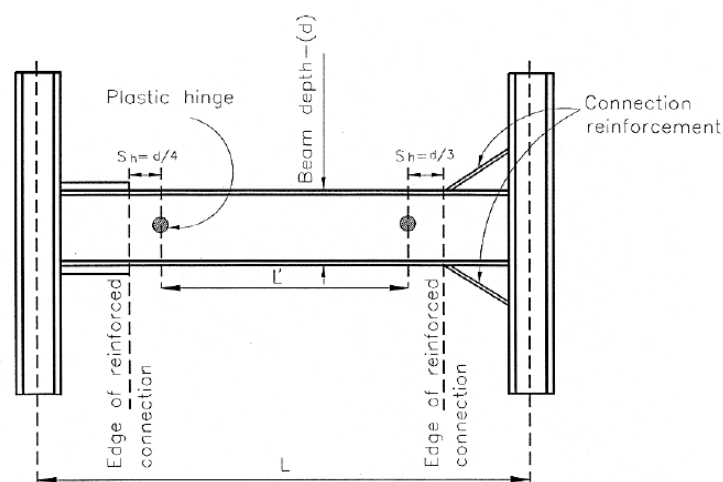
Typical plastic hinge locations for reinforced connections.
